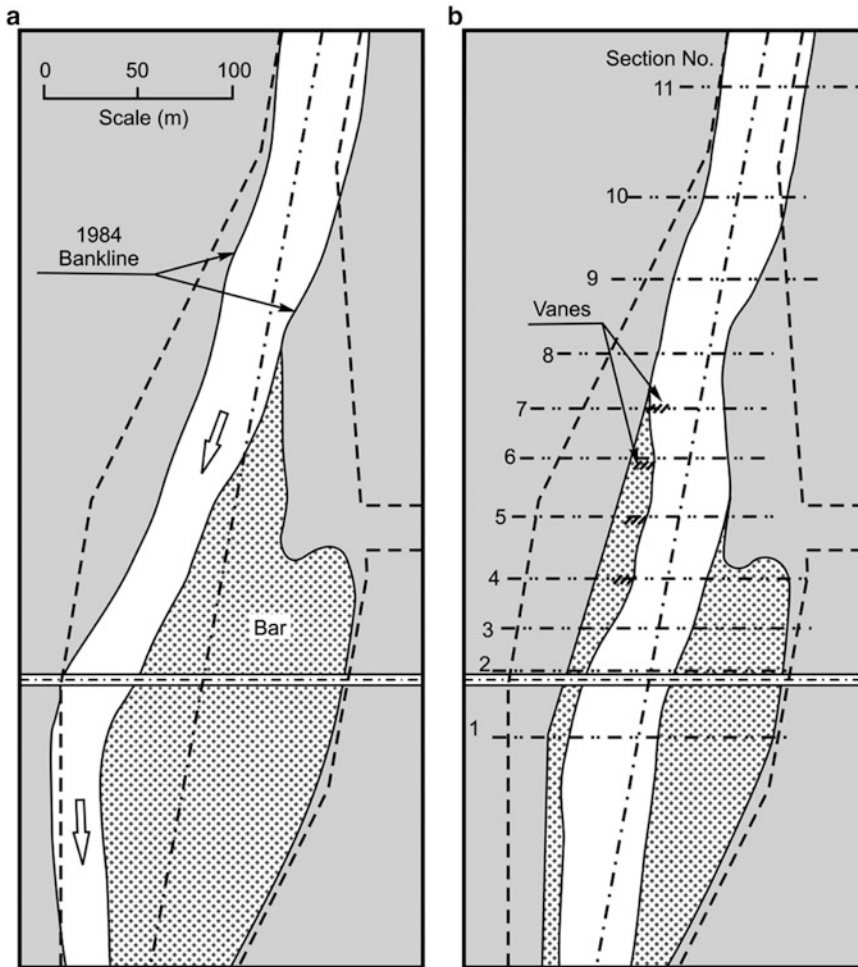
Plan of West Fork Cedar River bridge crossing, (a) prior to vane installation in 1984 and (b) 5 years after vane installation (Source: Odgaard and Wang (1991b), ASCE)
